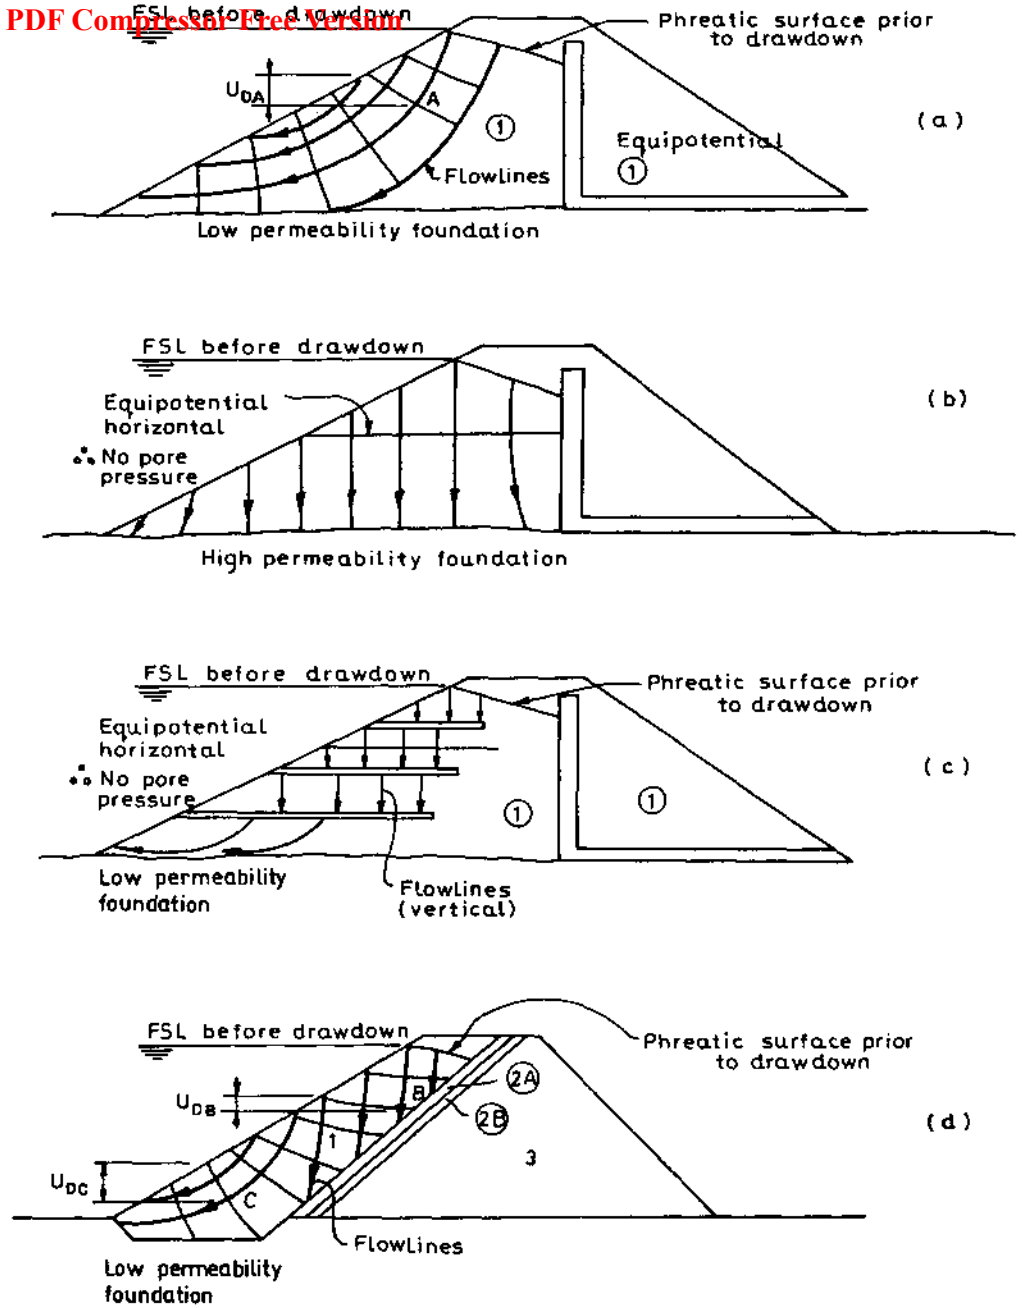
Drawdown flownets a) earthfill with chimney drain, low permeability foundation; b) earthfill with chimney drain, high permeability foundation; c) earthfill with horizontal drainage blankets; d) sloping upstream core, low permeability foundation.
